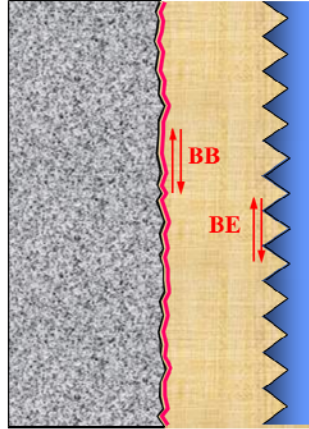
Bond Stresses along the Concrete Borehole and Steel Anchor Element
